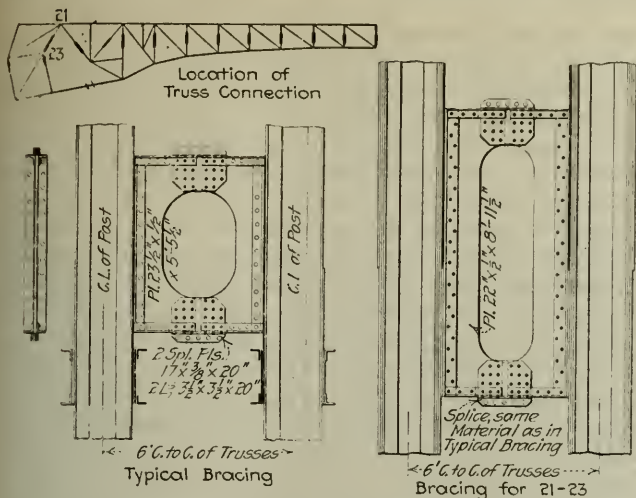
SEPARABLE DIAPHRAGMS CONNECT INNER TRUSSES OF FOUR-TRUSS BRIDGE
